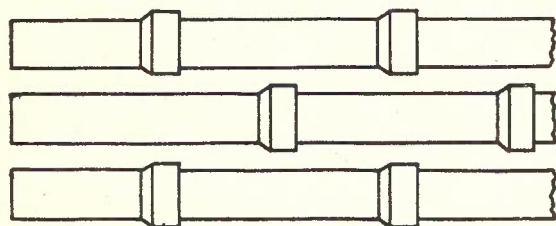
Staggering of Joints in Multi-Duct Run.
